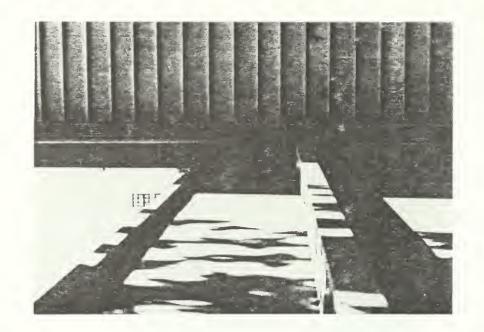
West India Goods Store, east end of north elevation, showing fence at northeast corner.
